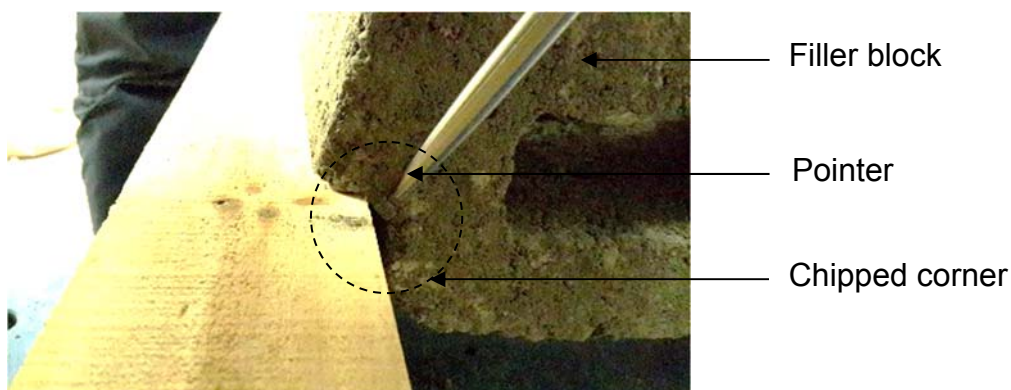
Typical picture of an ‘ill-fitting’ filler block
